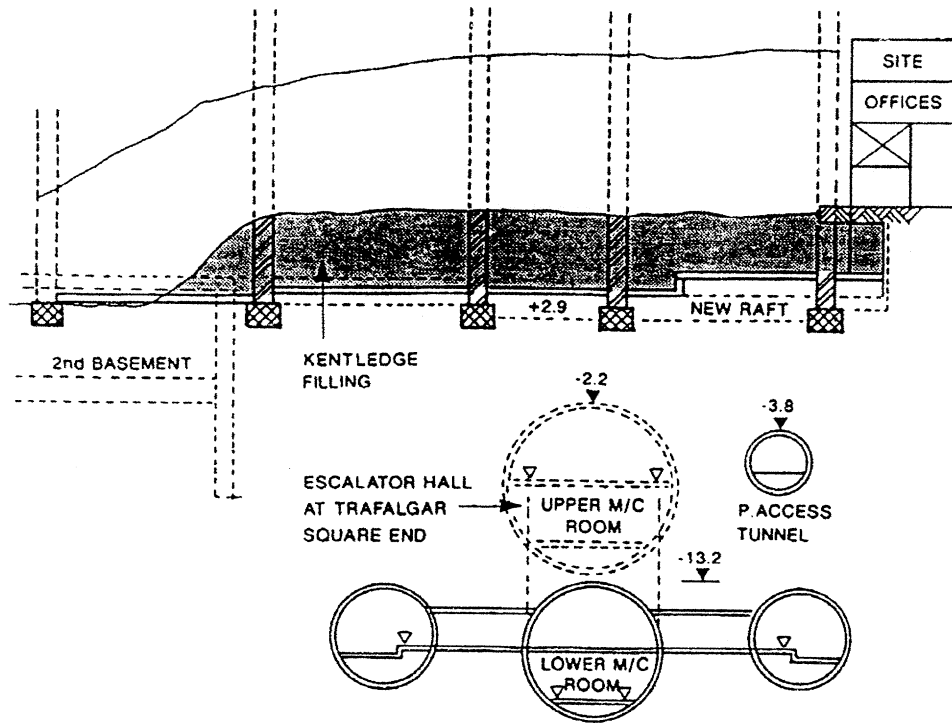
North-South section of construction over the Jubilee Line (Clayton, et al., 1991).
